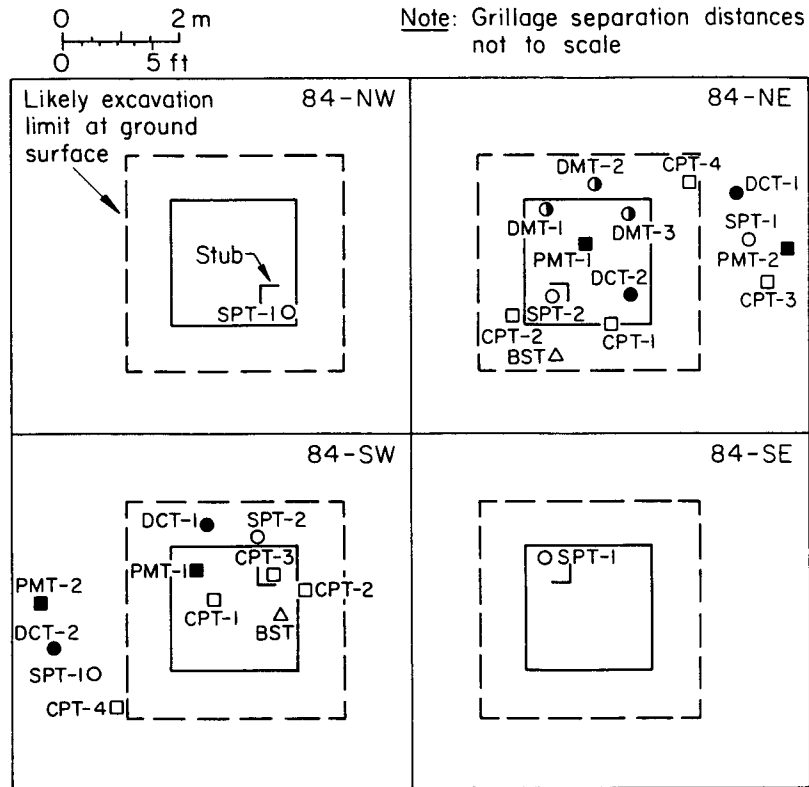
In-Situ Test Locations for Hickling Station Grillage Set No. 84
